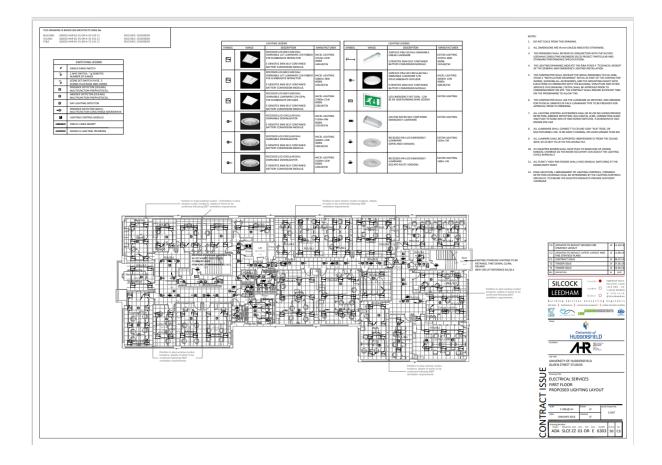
Electrical Services First Floor Proposed Lighting Layout (Percy Shaw House Building).
